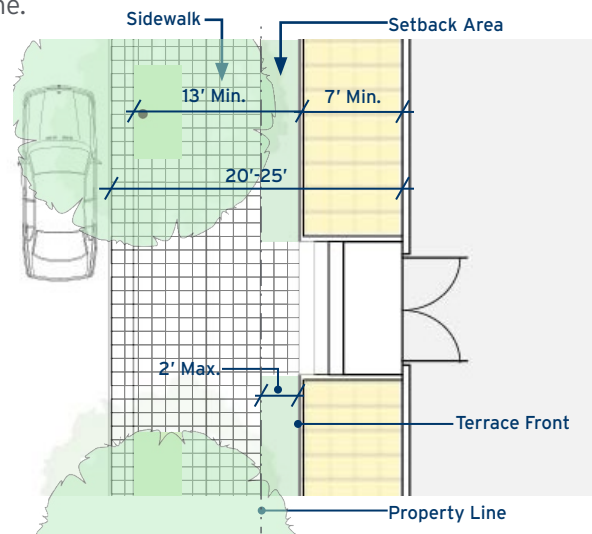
Raised Residential Terrace Conceptual Plan
